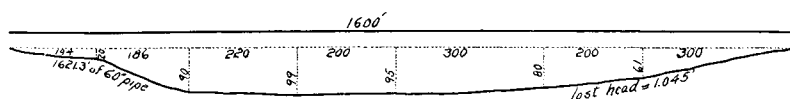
Siphon No. 14, Arkansas Valley Conduit, Pueblo.
